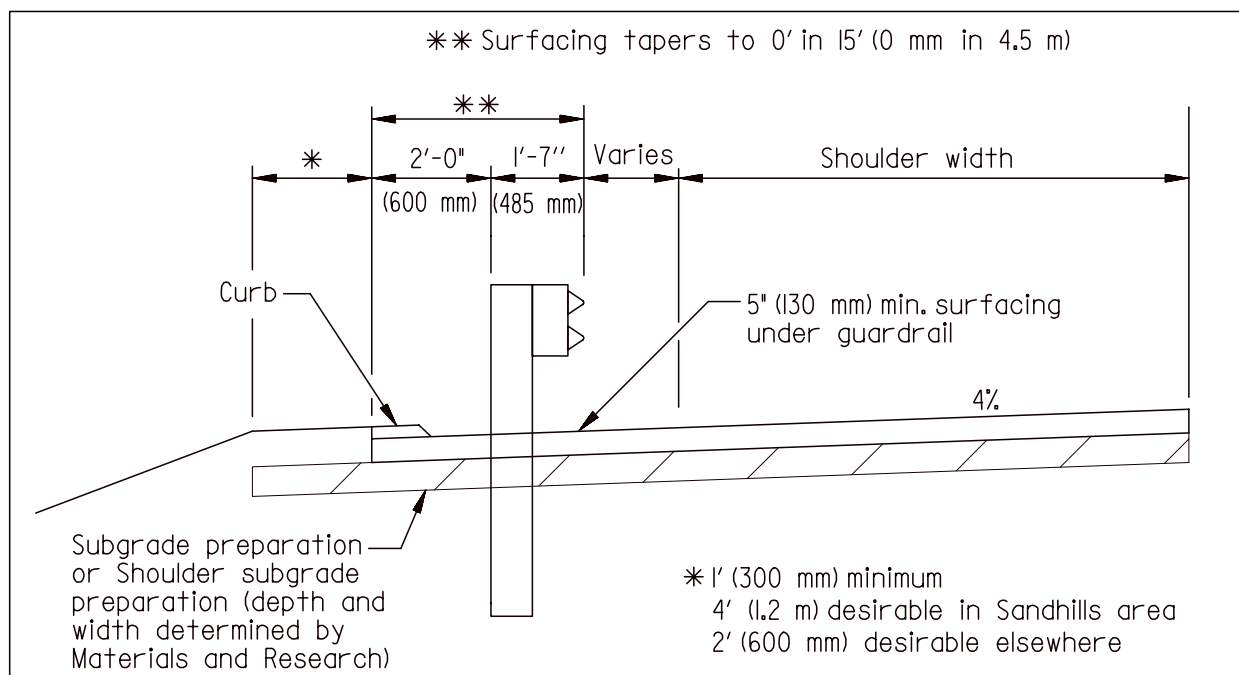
Surfaced Shoulder with Curb at Safety Beam Guardrail Location
